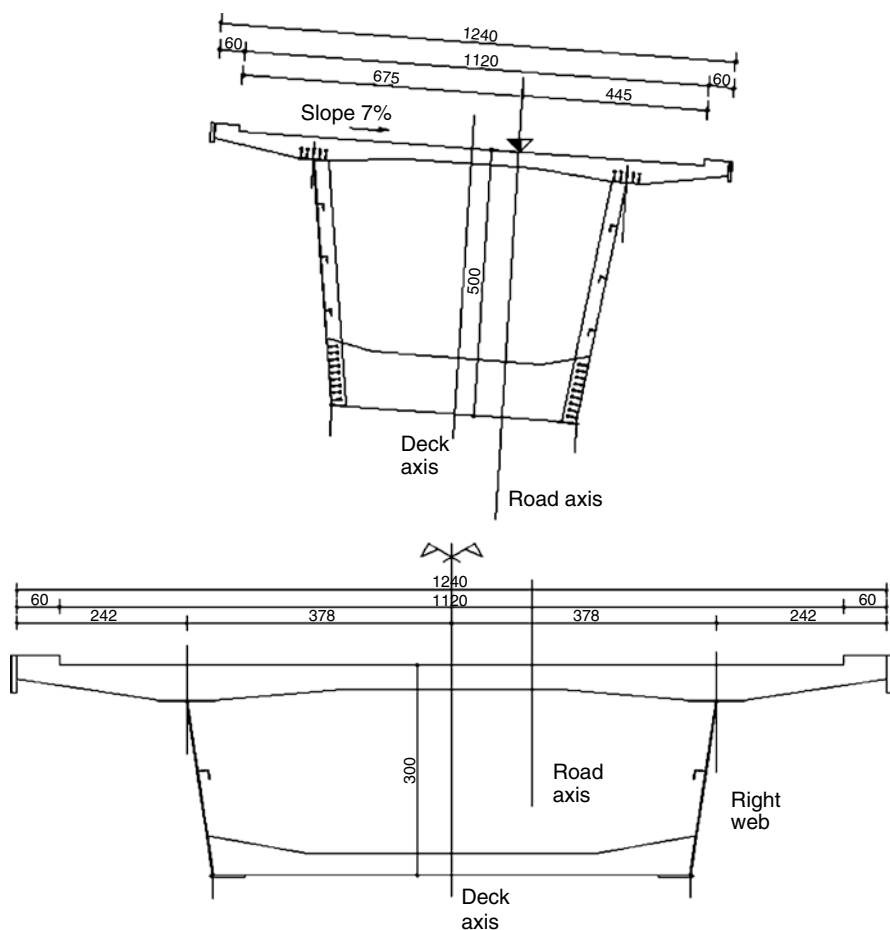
Transverse sections above the pier (*top*) and at mid-span (*bottom*)
